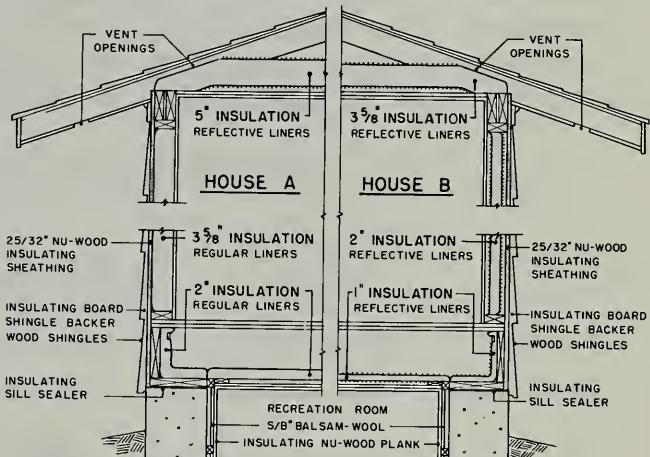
Cross section drawing showing construction details and ceiling, wall and floor insulation in each house.
